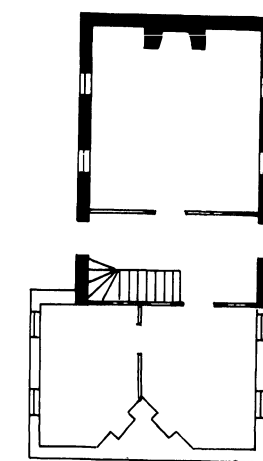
Robert Tate House, "Clover Mount," Plan. Original hall-parlor house to right, with addition to left.
